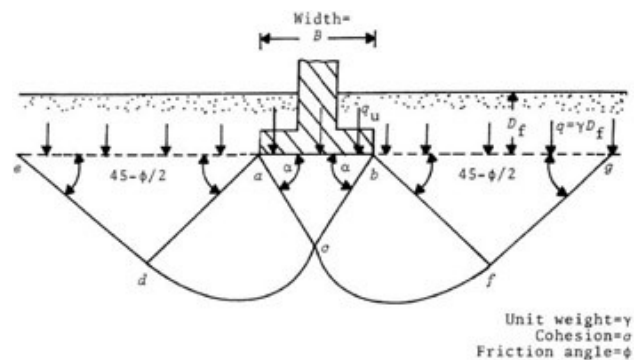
Bearing capacity failure mechanism in soil under a rough rigid continuous foundation subjected to vertical central load (Terzaghi, 1943).
